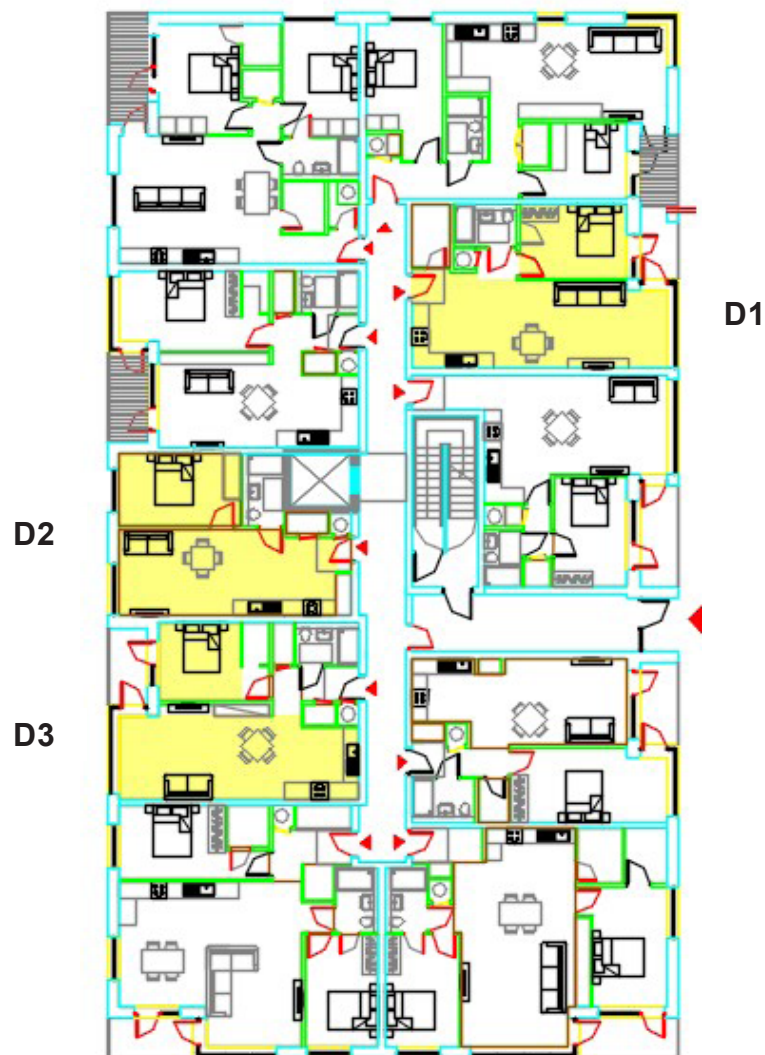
Ground Floor Plan of Block D indicating rooms assessed for Daylight
